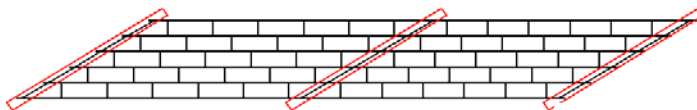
Alternative Beneficial Staggered Diaphragm or Cross-Frame Framing Arrangement for a Straight Bridge with Parallel Skew
